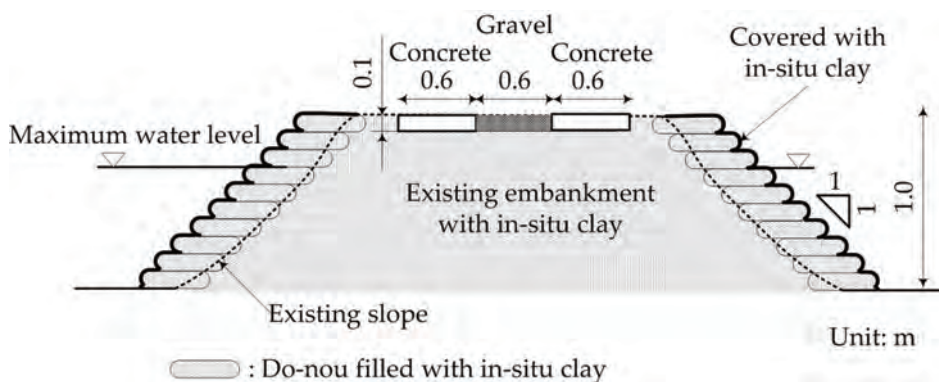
Design of concrete pavement and Do-nou retaining wall.
